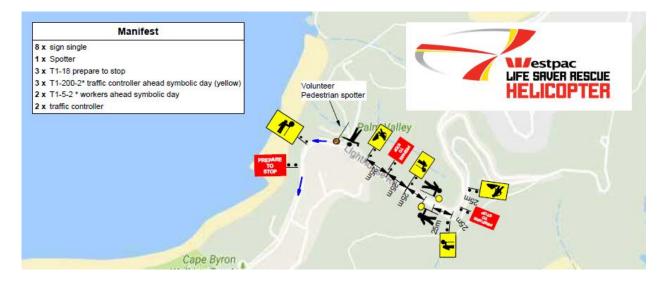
Traffic control proposed for eastern section Lighthouse Road. Coming down from Lighthouse (refer to Figure 2). Traffic control to be in place from 6am to 12.30pm.
